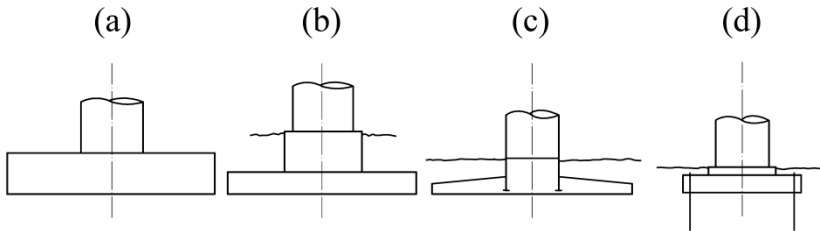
(a) Plain Slab; (b) Stub and Pedestal; (c) Stub Tower Embedded in Tapered Slab; (d) Slab Held Down by Rock Anchors
